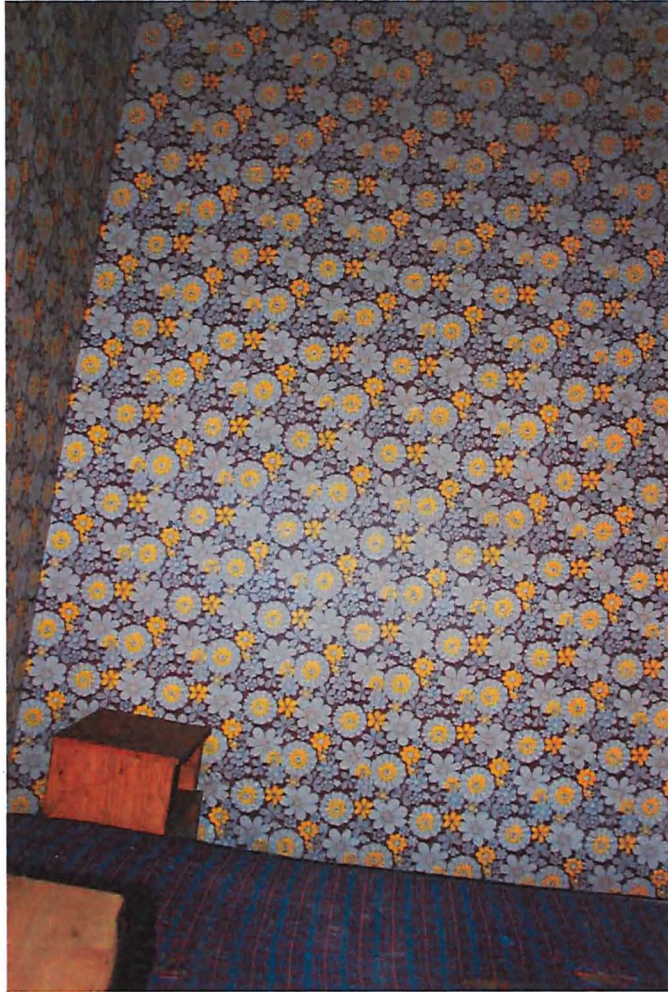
& 43 – Room 3-01, looking east, wall paper finish and ceiling timberboard finish.
